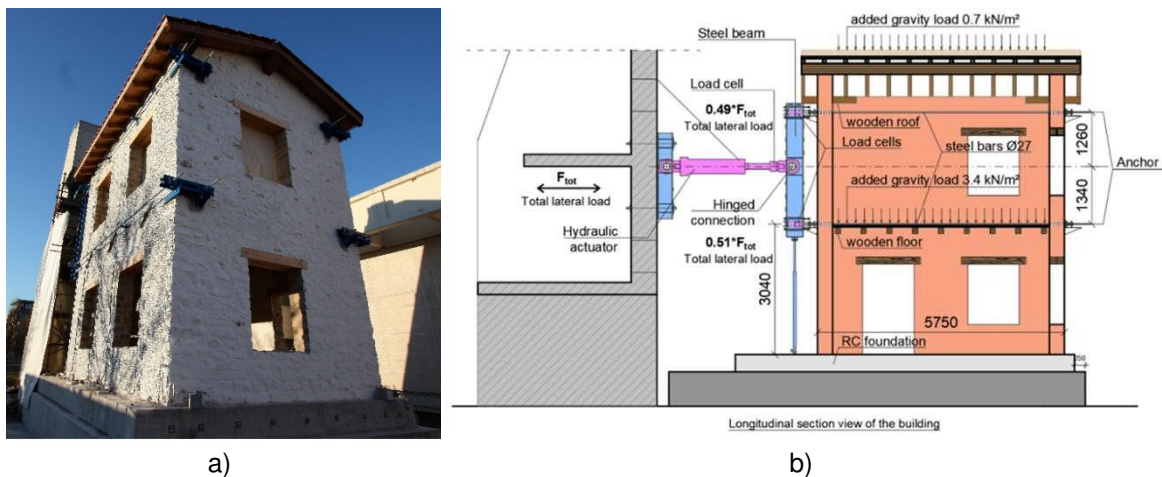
North-East view of the Pilot Building (a); Test setup (b)
